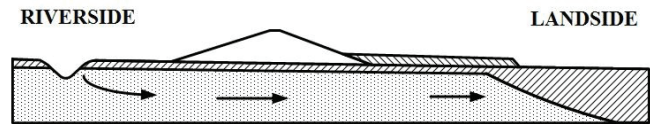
Installation of a berm while considering foundation material conditions (USACE 2000).
